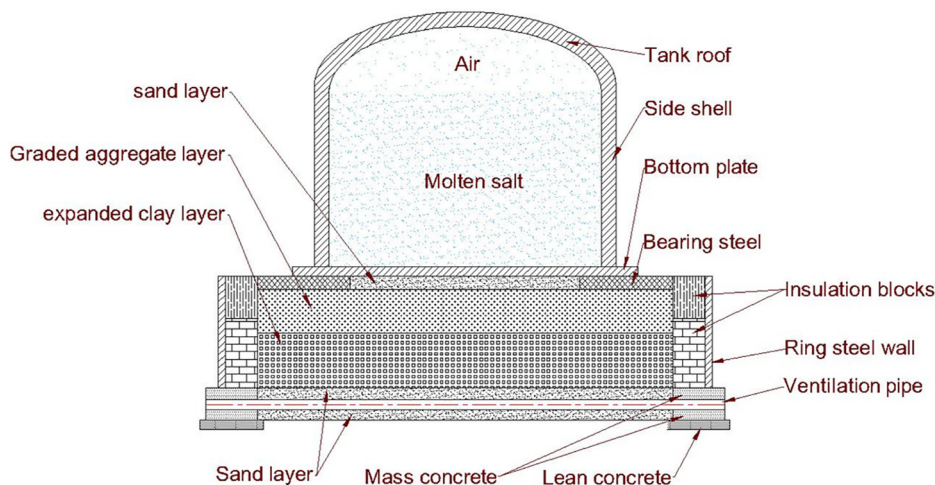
Structure of the molten salt tank and tank foundation of a tower CSP plant.
